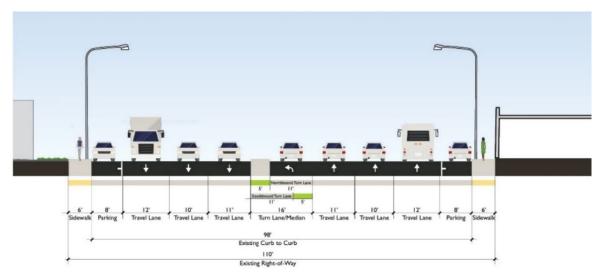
Existing Conditions Cross-section: Shields Avenue to Hedges Avenue (facing North)
